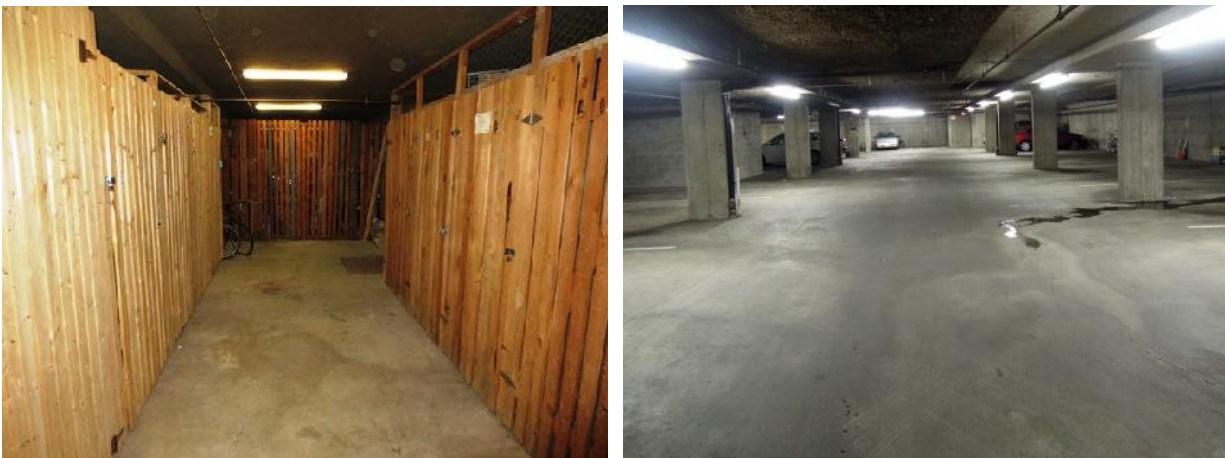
A locker room (left). A view of the concrete slab on grade (right).
